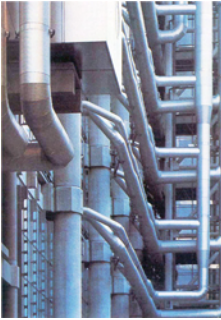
(c): Main services running vertically down towers, connected into each level of the building through raised floor and ceiling void
